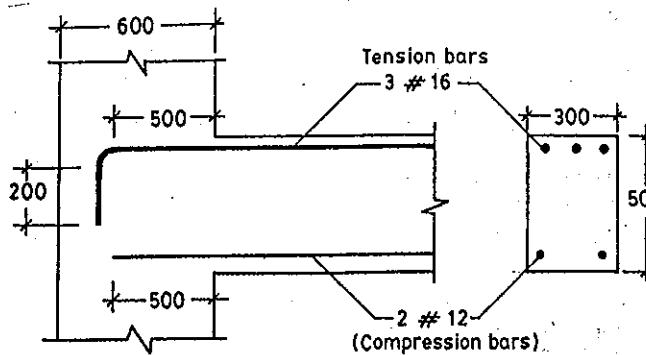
Anchorage Details in Doubly Reinforced Beam
